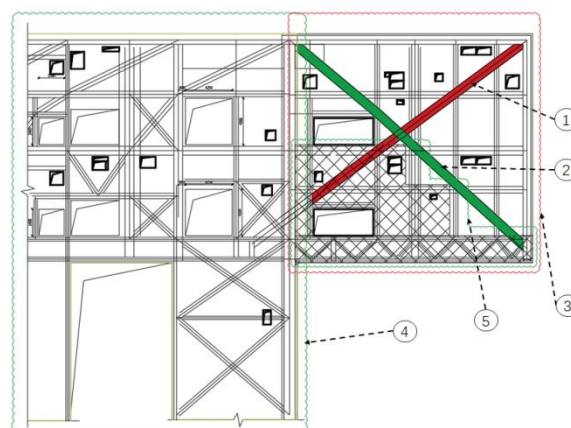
Schematic Diagram of the Segmented Construction Principle of a Large-span Cantilever Wall
